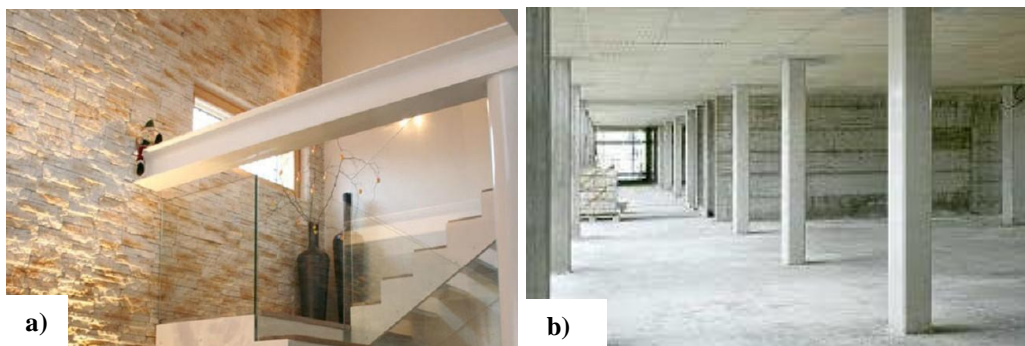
Examples of vertical elevation structures: a) Structural walls; b) Columns
